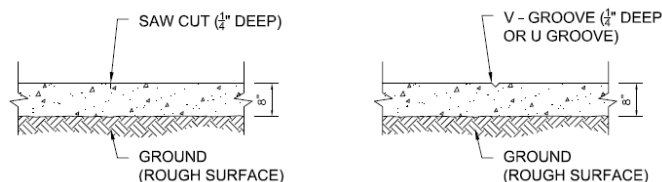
Typical concrete slab on grade with shallow saw cut at top surface.
